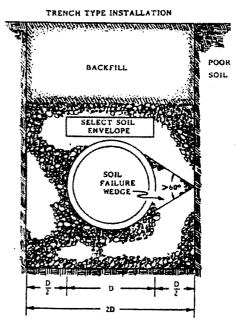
Minimum Embedment Width When Trench and Native Soil Can Sustain a Vertical Cut
